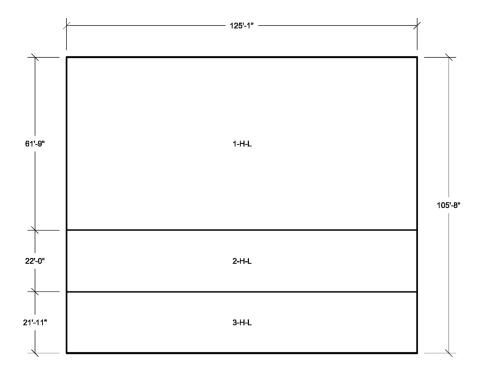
H.3-23 West Wall Looking East Horizontal Reinforcement Zones Near Side Face
